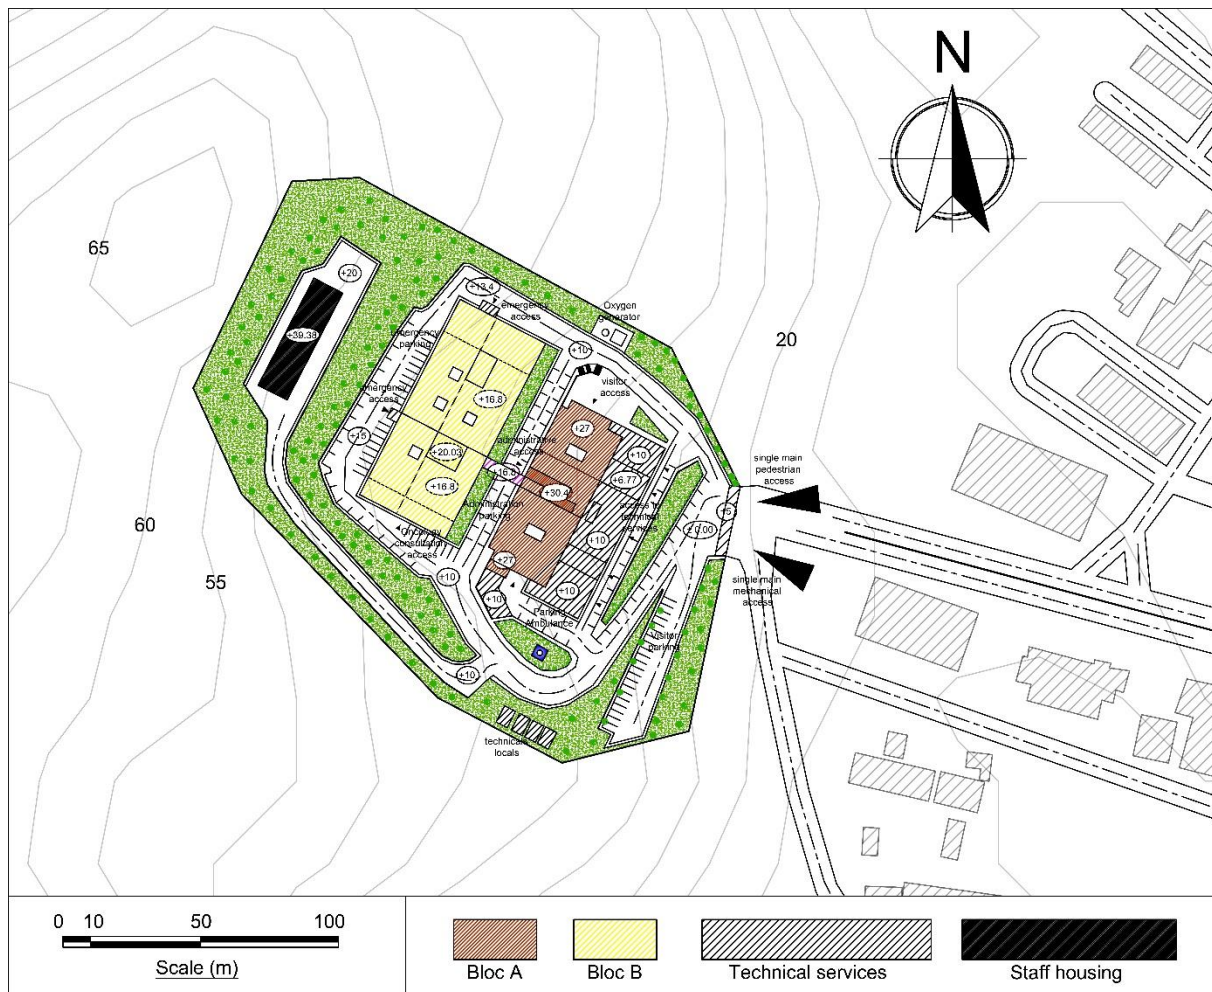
Ground plan of EPH ABDEREZZAK BOUHARRA (Source: author; 2023)
